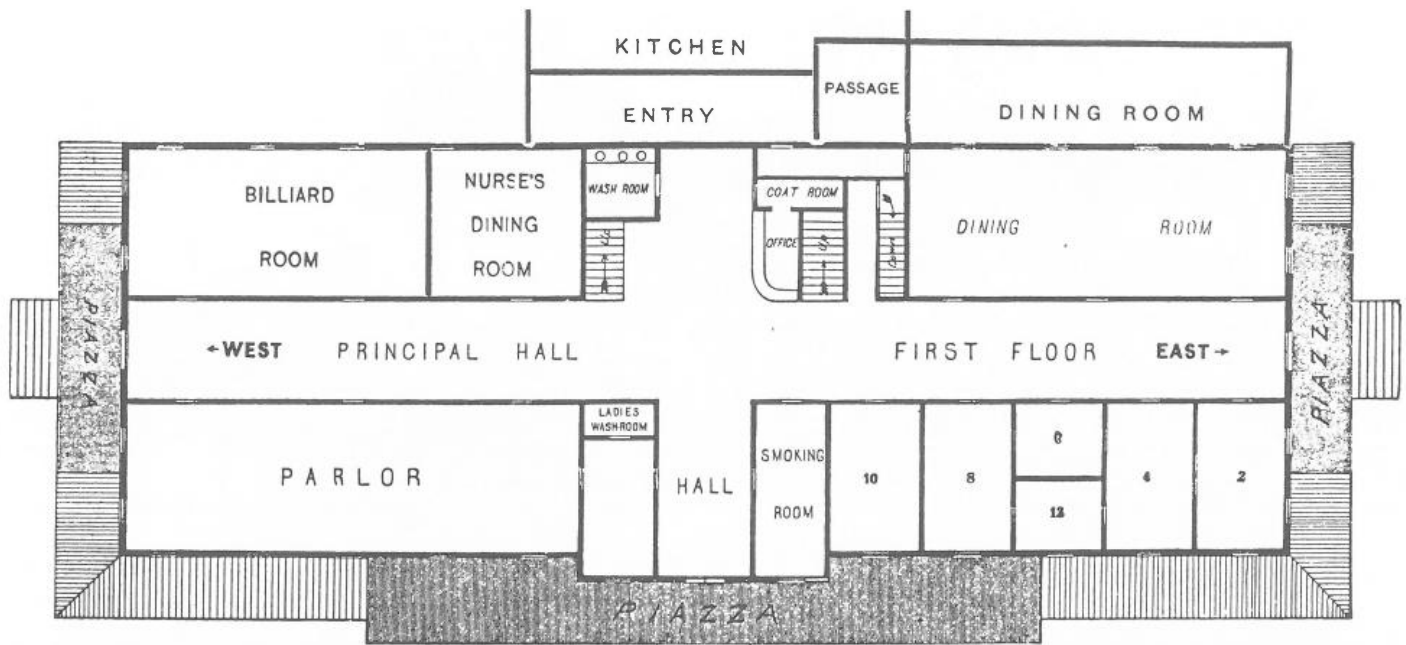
First Floor Plan, Wassaumkeag Hotel (Photo MHPC).
